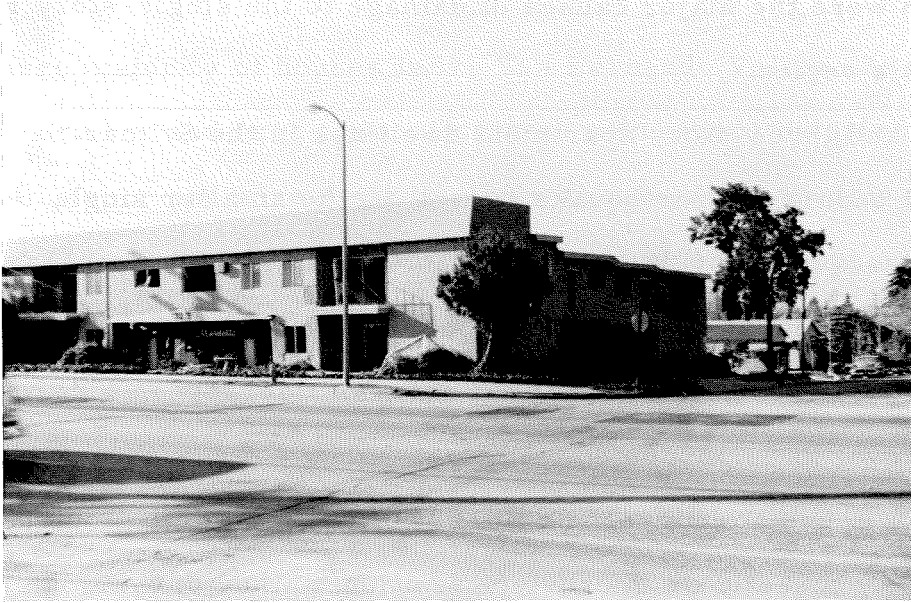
Mardette Apartment Buildings. Northwest building. Foothill Boulevard, San Fernando.
